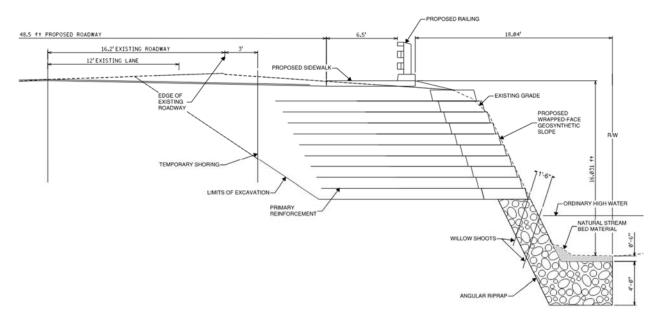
Wrapped Reinforced Slope Roadway Cross Section
